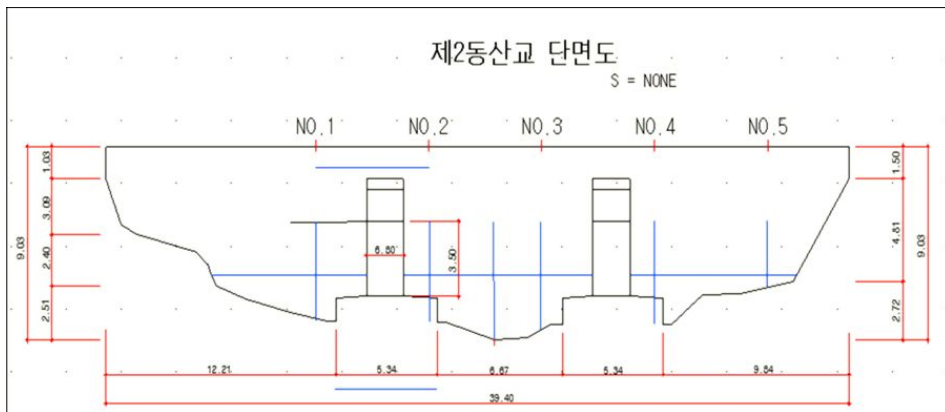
Measurement of 2nd Dongsan bridge cross section
